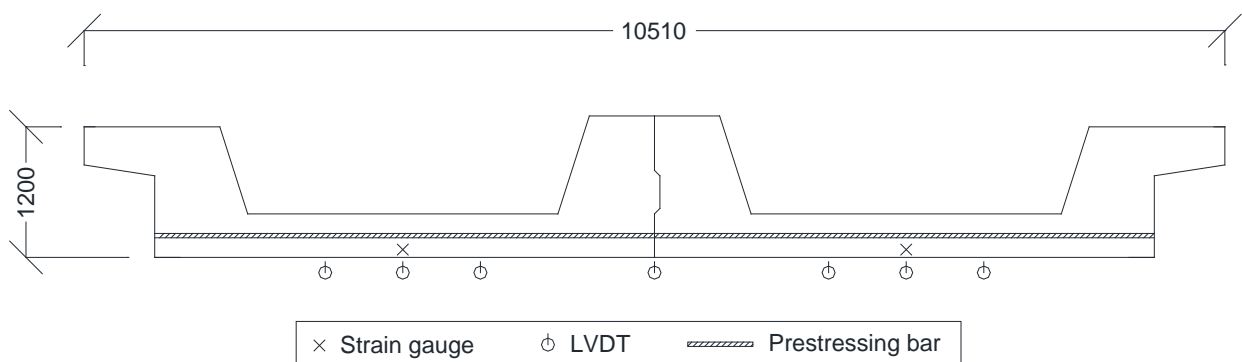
Cross section of the double-trough with strain gauges, LVDTs and prestressing bars.
